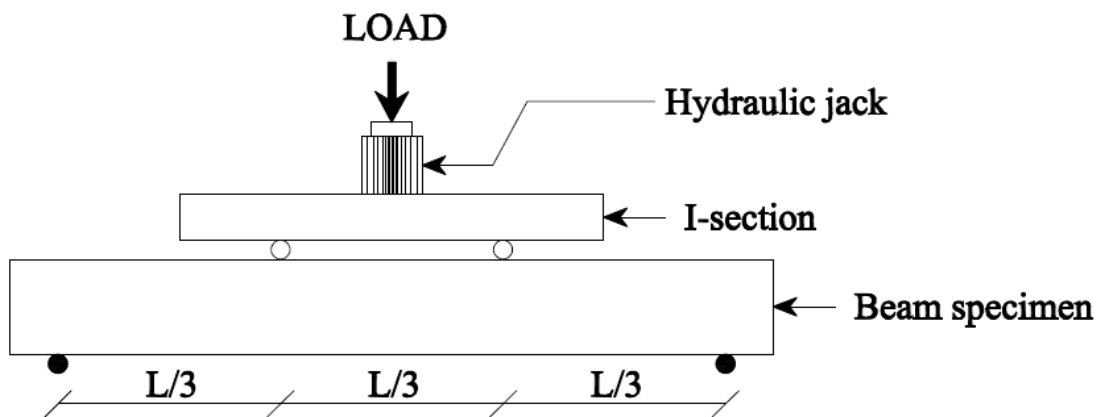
Arrangement Prior to Flexure Test of the Beam Specimen
